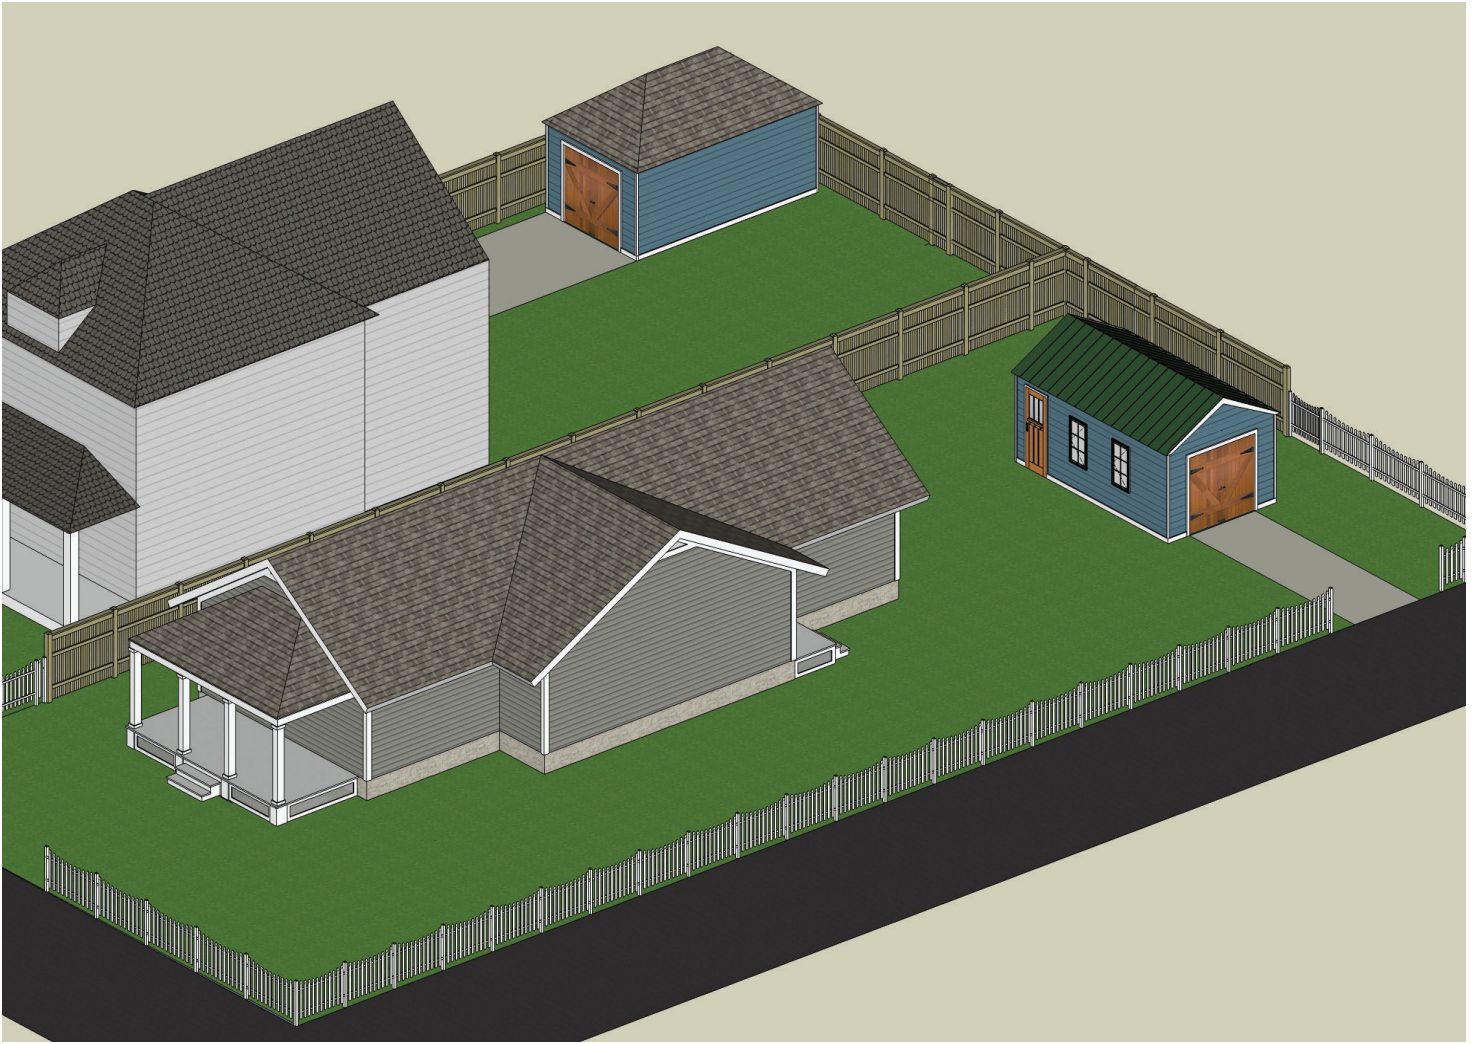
An example of a standing seam metal, gable roof garage located on a corner lot that could be reviewed under the ACoA process. Note how the roof form and pitch of the garage match the gable of the main dwelling.
